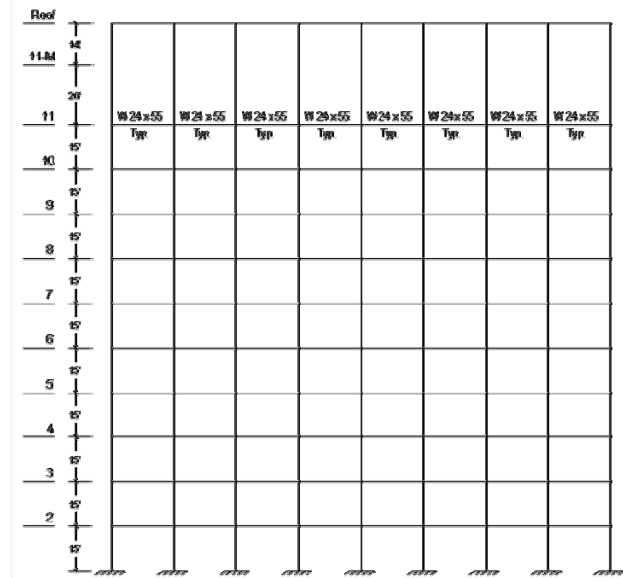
Redesigned Gravity-Only Frame (proposed design)
